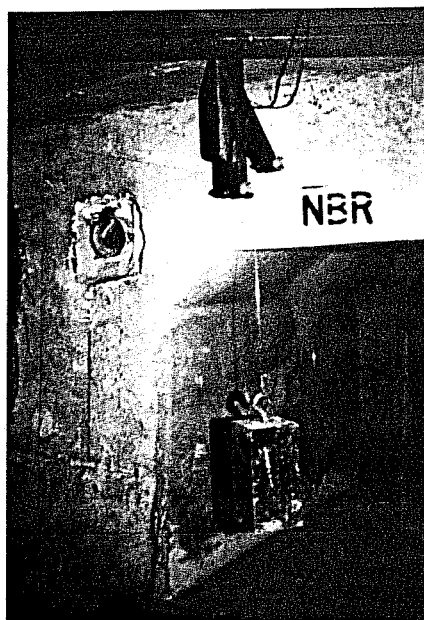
Live end anchor and calibrated weight inside the box girder bridge.
